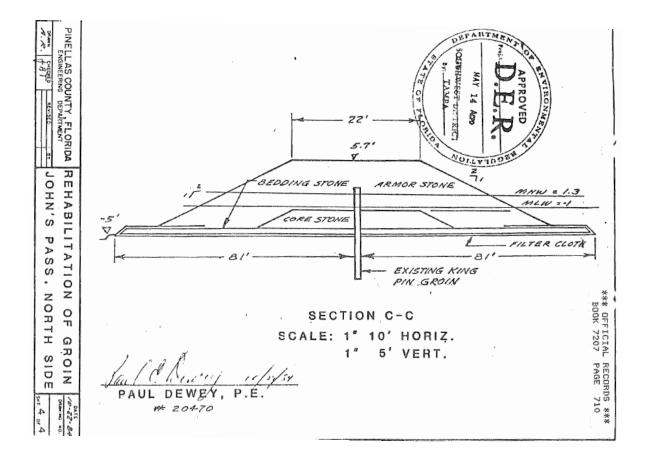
John's Pass Terminal Groin Typical Cross-Section
